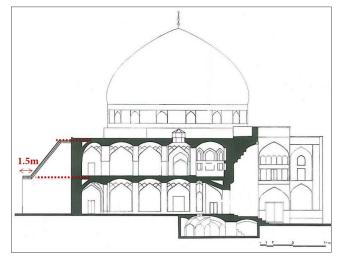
Increase section of the buttress where the roof of first floor's hallway is located (Isfahan's Archives of Cultural Heritage)
